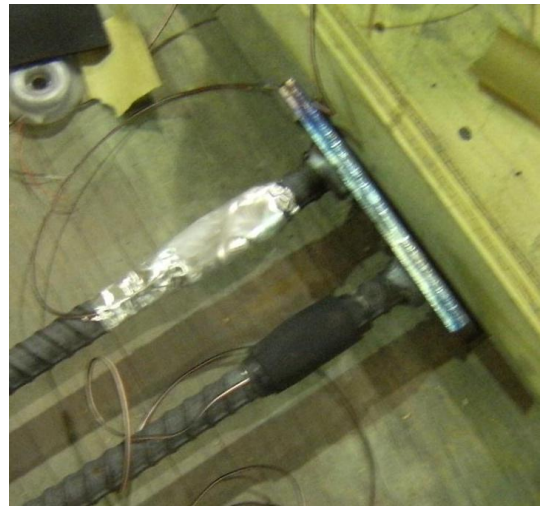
Protective Coating Applied to Strain Gages on Embedded Plate Connection
